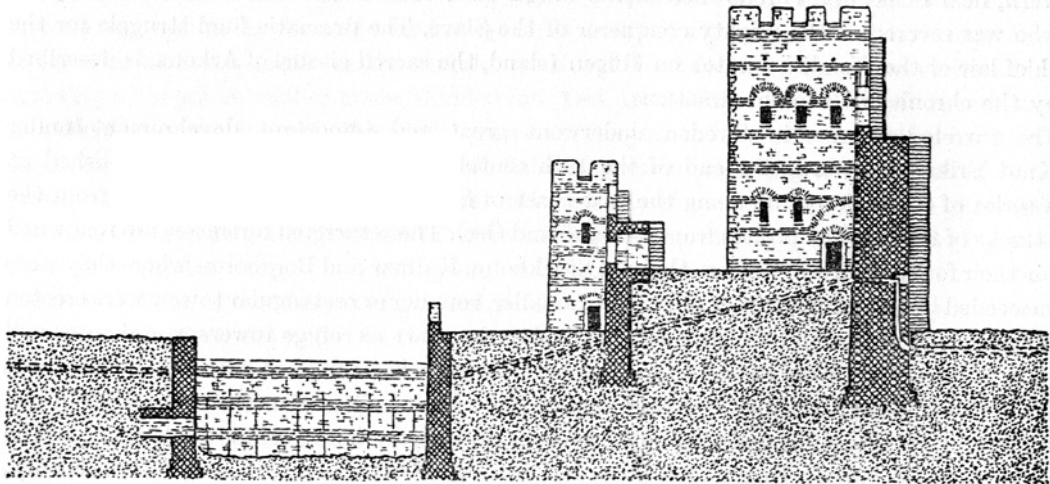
Constantinople, Section Of The Reconstruction Of The Wall.
